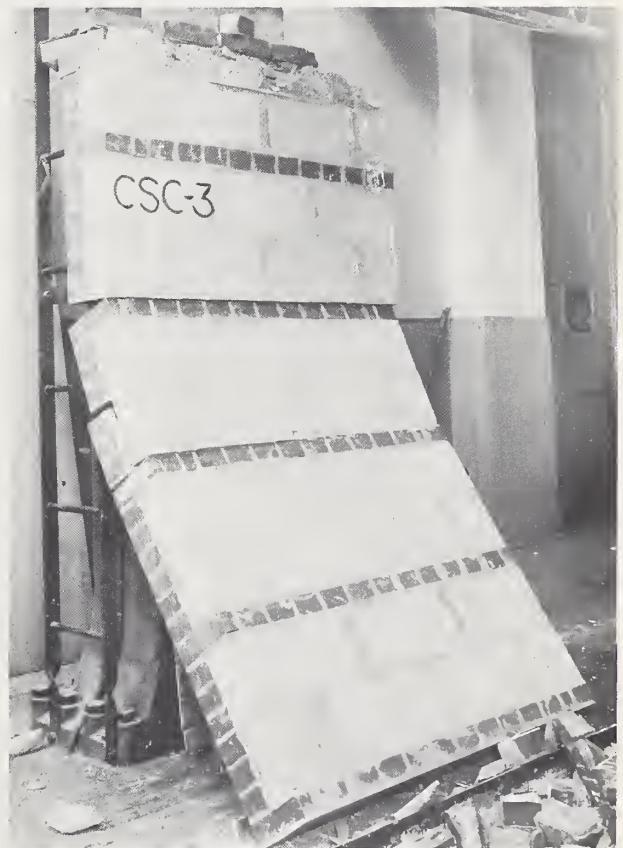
Compressive load failure of composite masonry wall CS-3.
